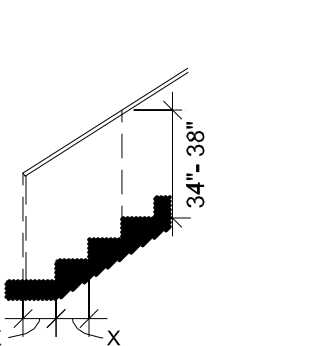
TOP HANDRAIL EXTENSION AT STAIRS
